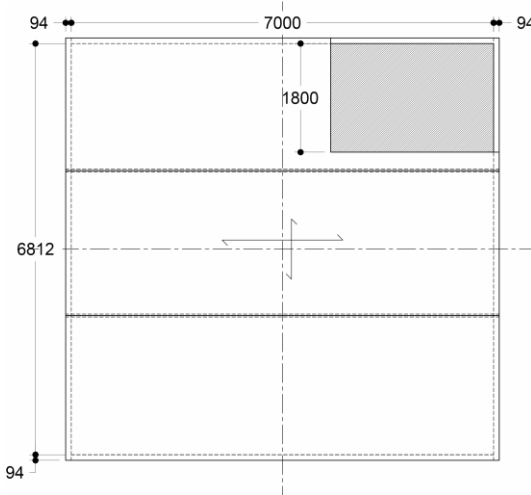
2700 x 1800 mm rectangular stairwell adjacent two supporting walls
